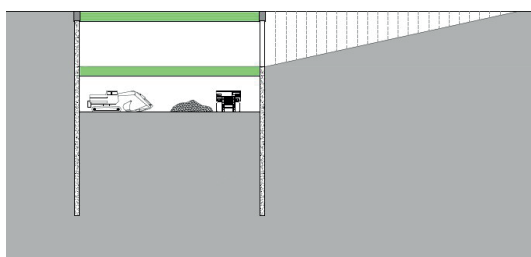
Schematic of the Fourth Phase - Excavation Under the Roof Slab to the Level of the Next Slab
